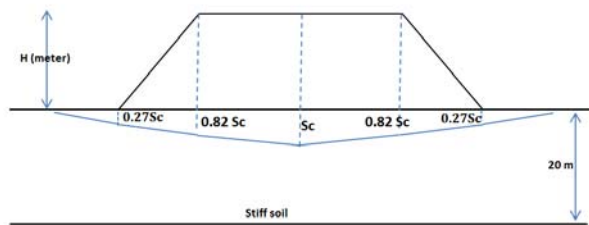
Settlement ratio of 10 meter compressible soil under the embankment load.
